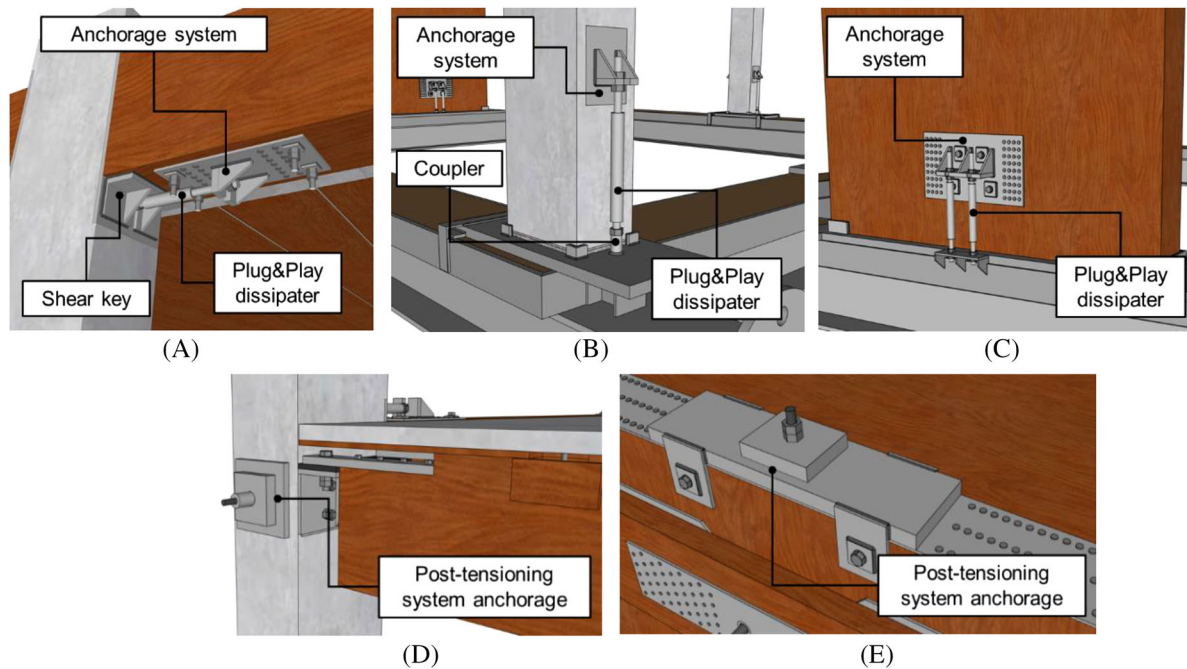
Test Specimen (*Skeleton Building*) details and dimensions.
